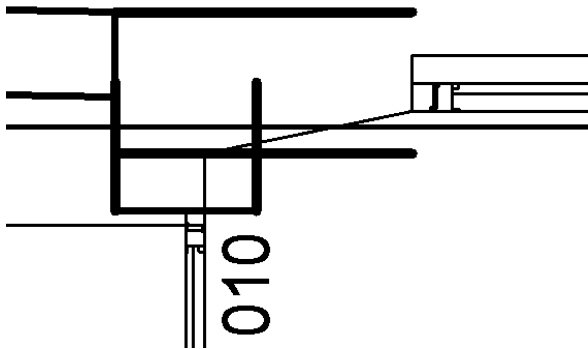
Non-native ‘.dwg’ file Linked in Revit - wall corner plan detail with errors
